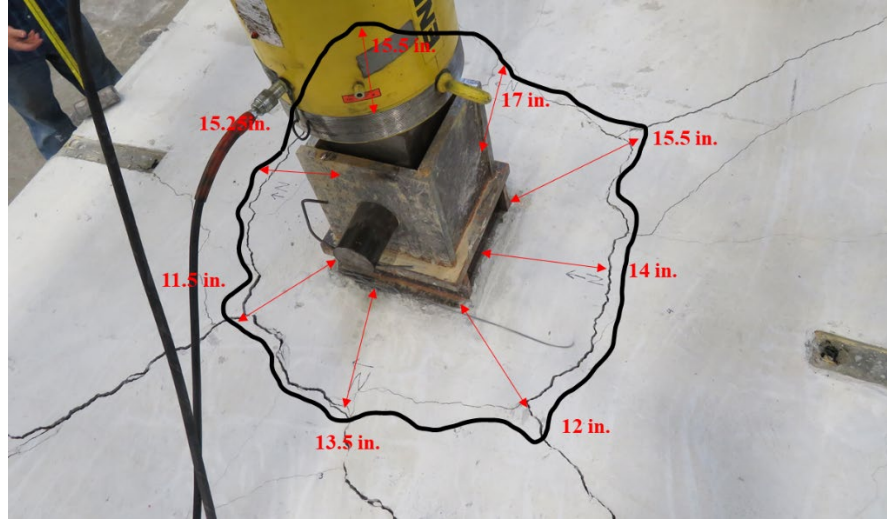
Plan view of cracks and formed on the concrete surface
